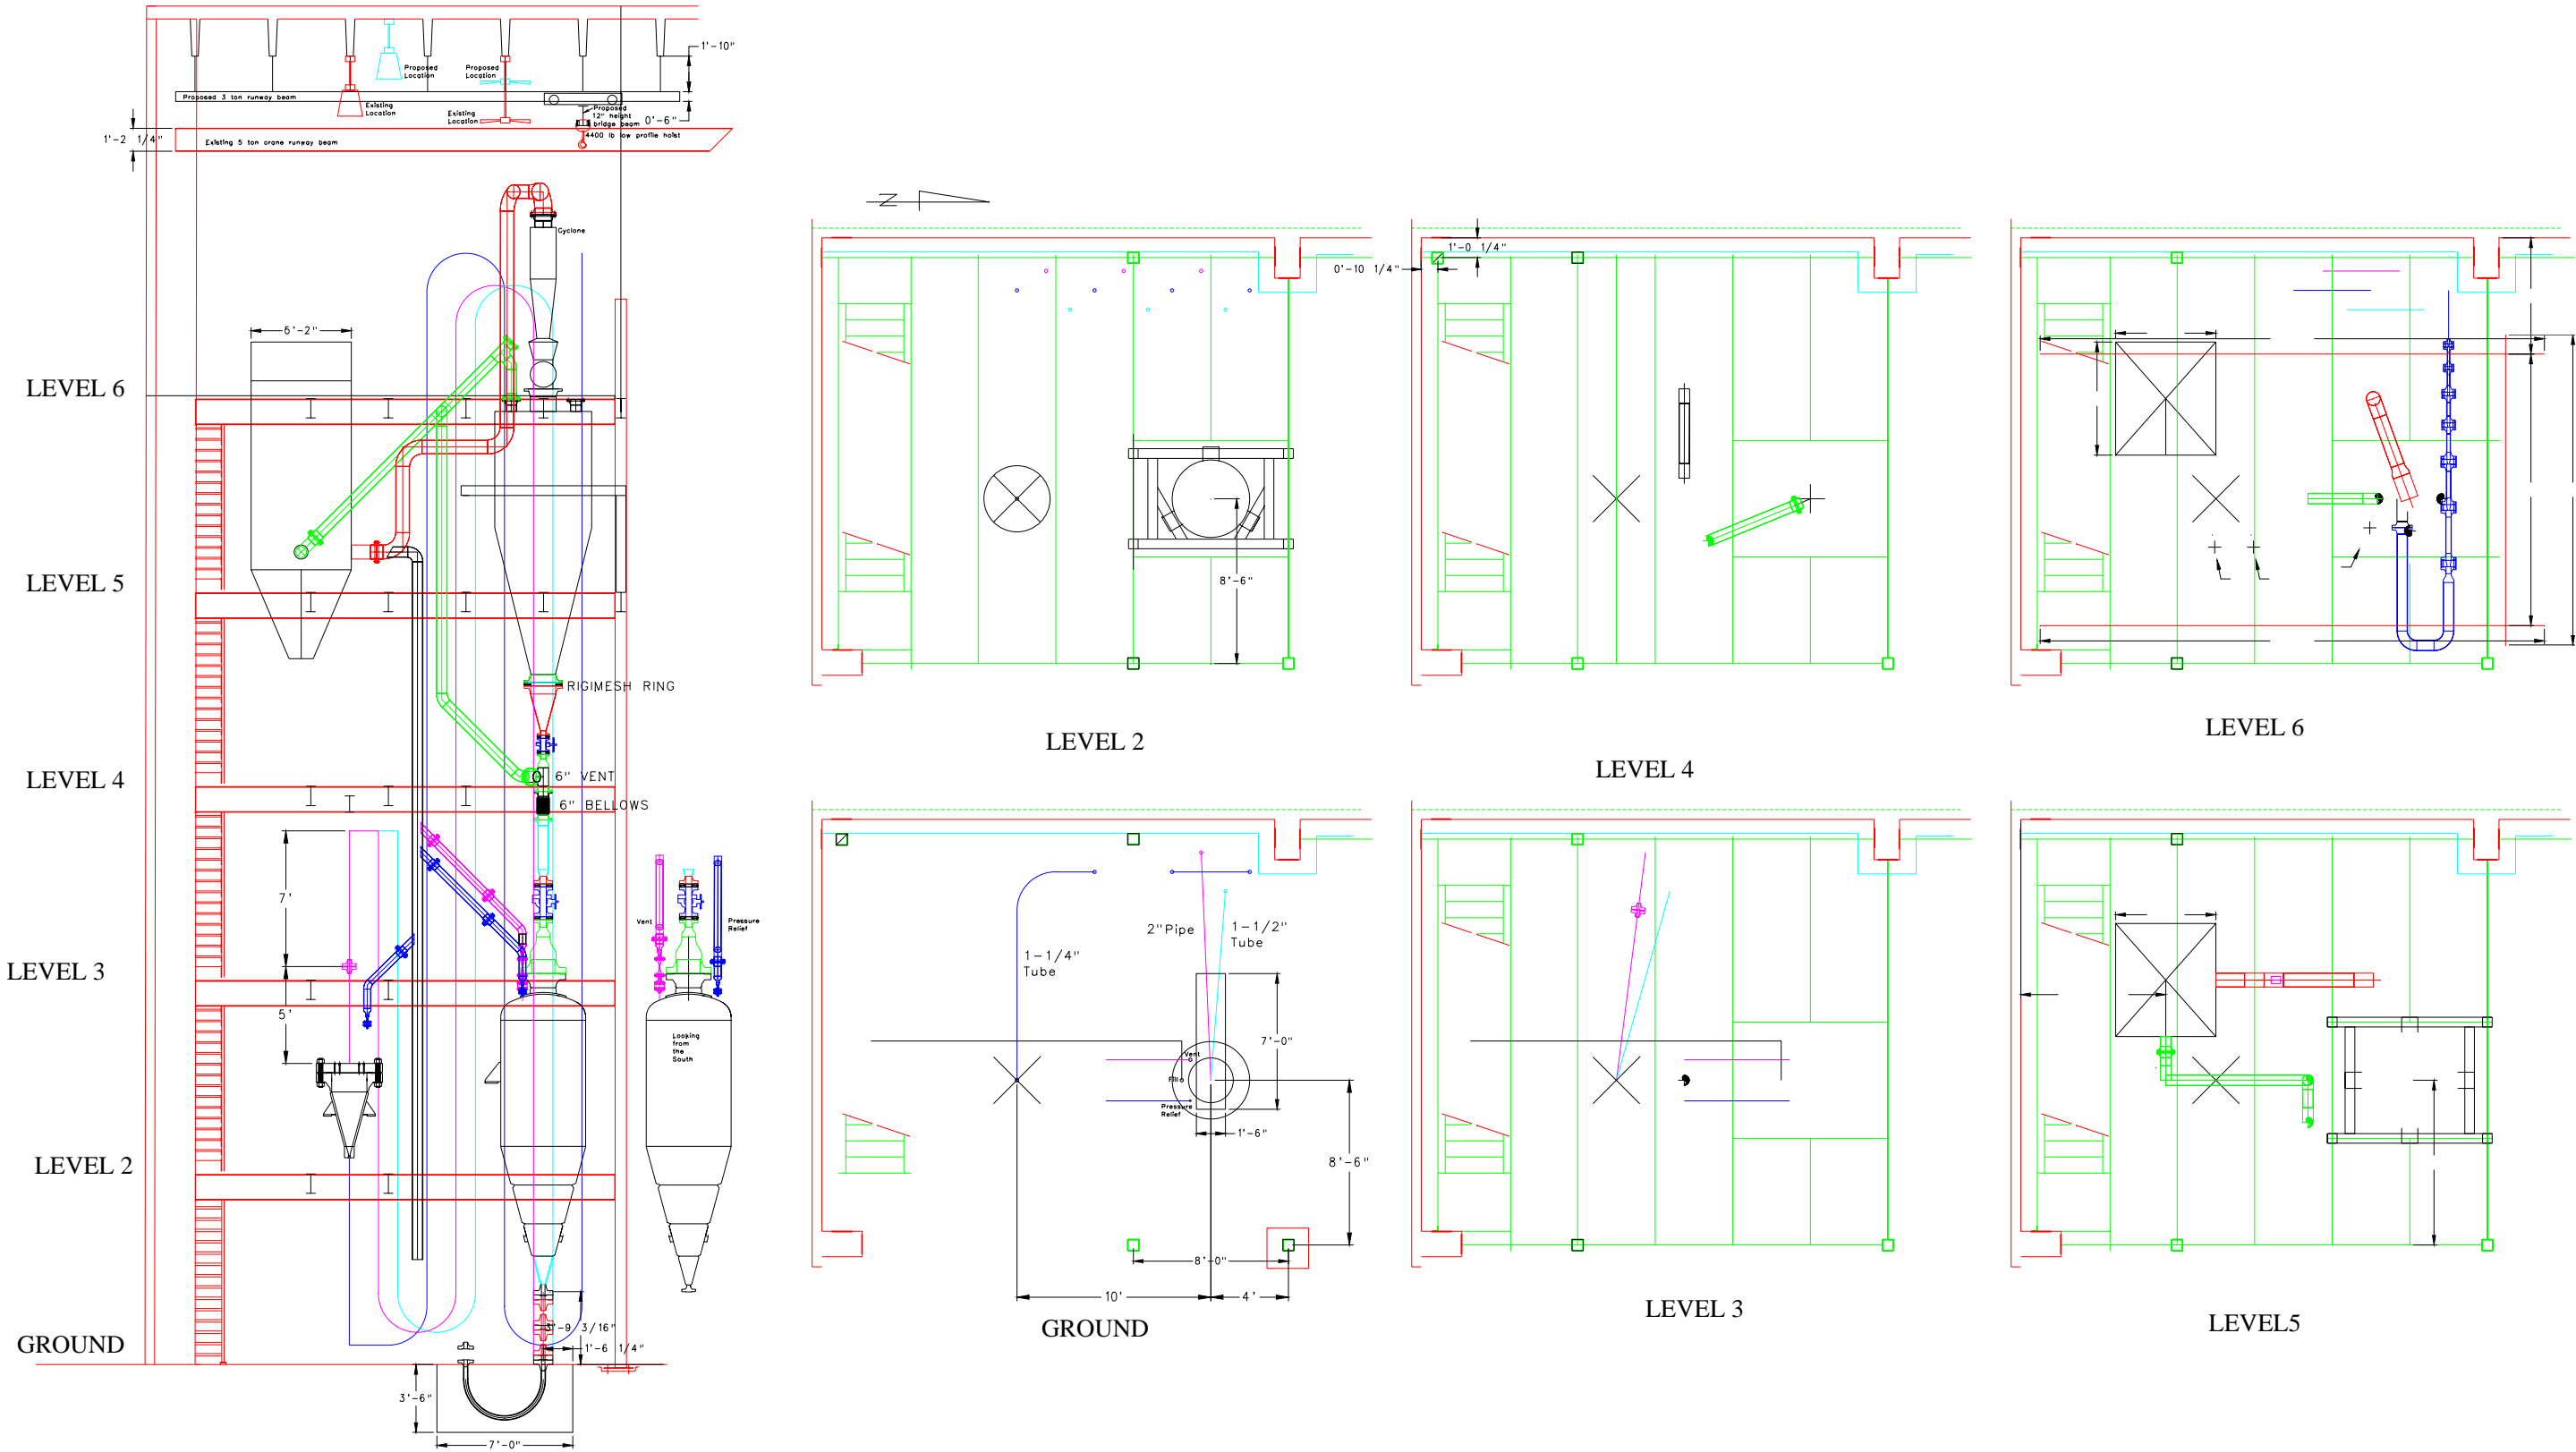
Test Stand Elevation and Plot Plans – Southwest Corner of Building (PWR Drawings 7R109700, 701 & 702 or UNDEERC Drawing 010406drh-version2000)
